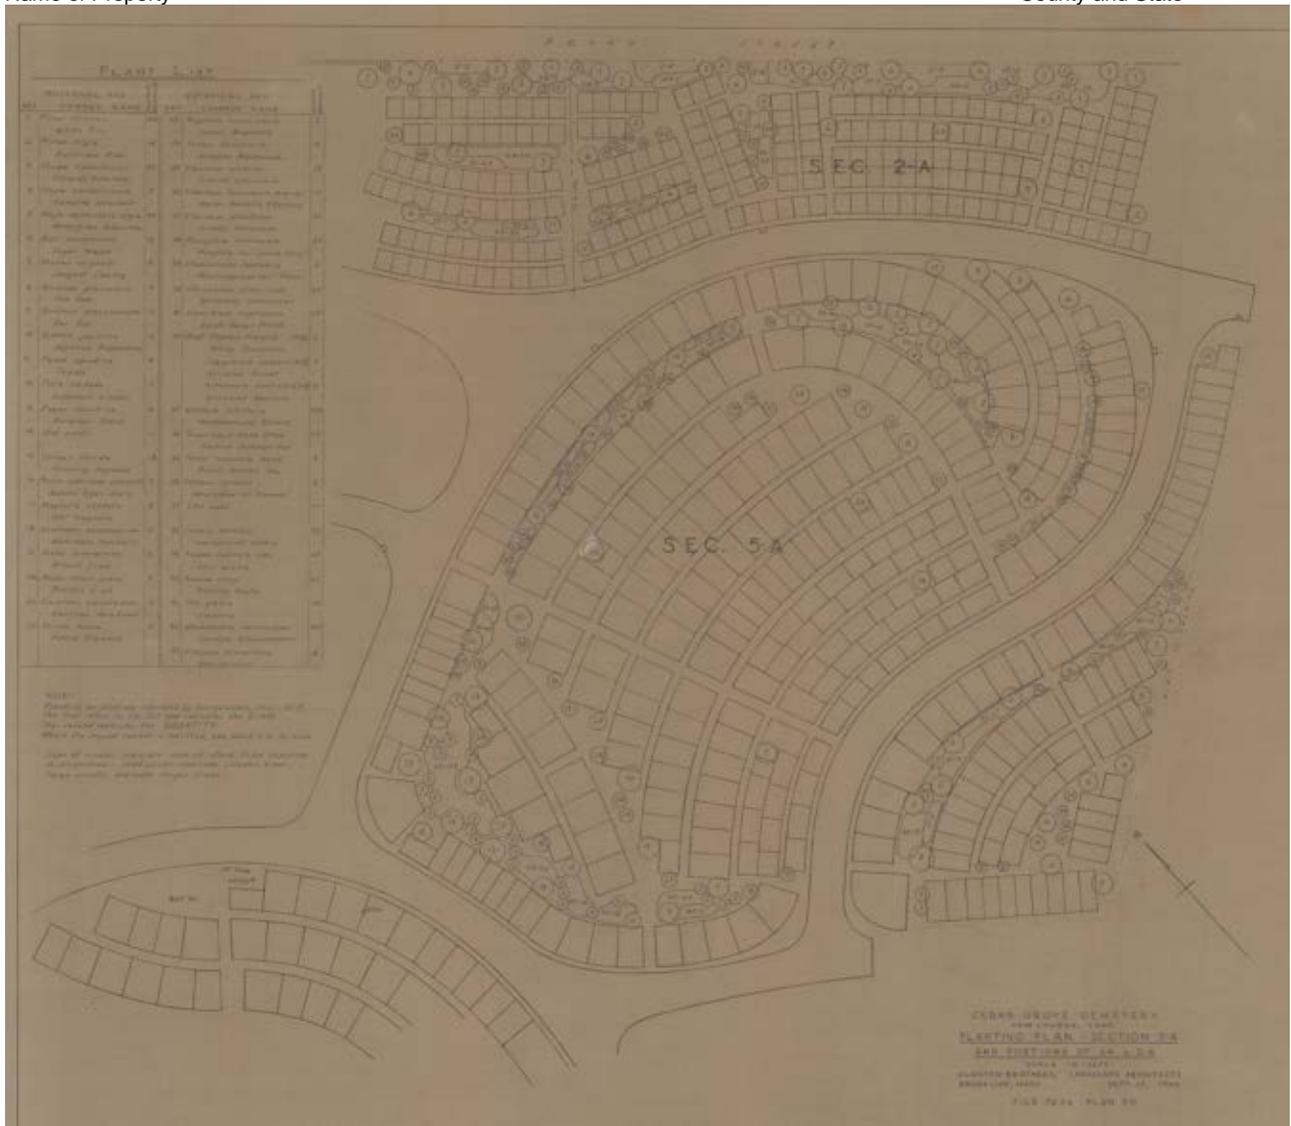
Lot and planting plan prepared by Olmsted Brothers for Sections 5A, 2A and 6A. September 15, 1960. File 7256, Plan 50.
